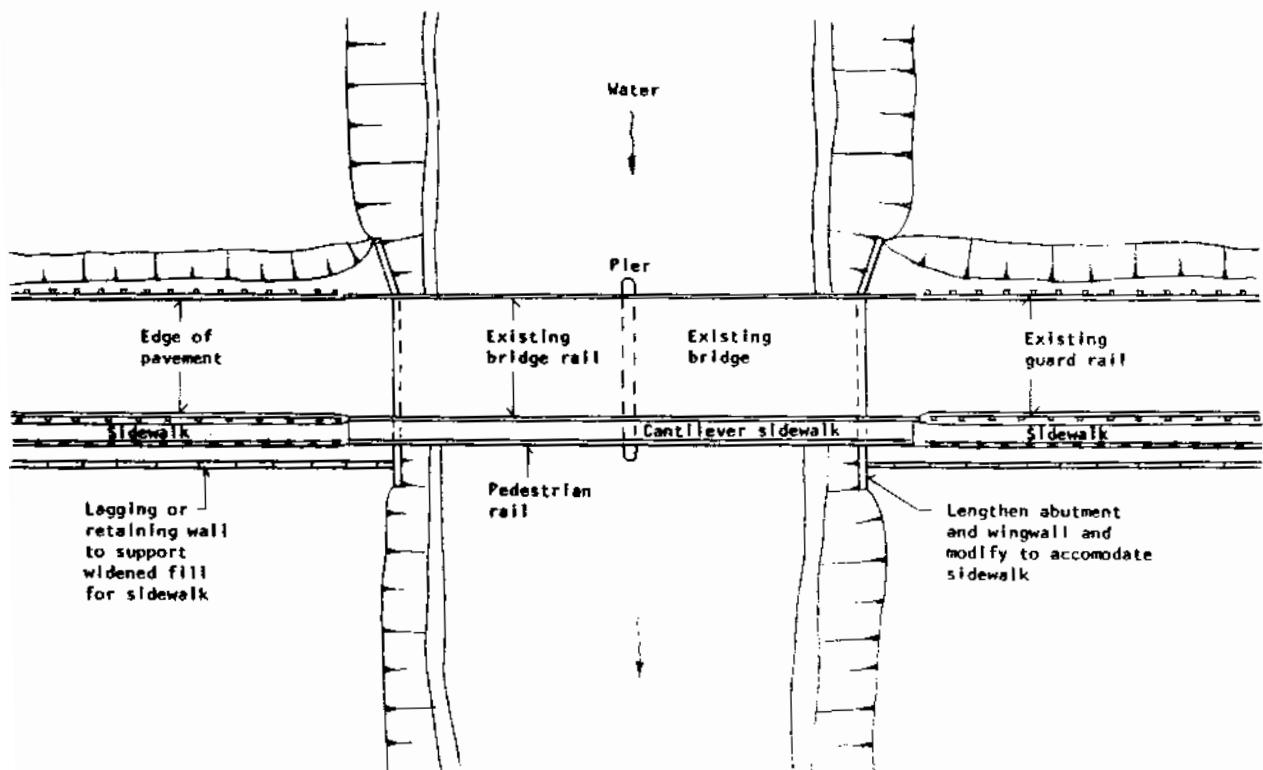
RETROFIT PROJECT 1 - CANTILEVER ADDITION OF BICYCLE AND PEDESTRIAN FACILITIES TO AN OVERCROSSING
